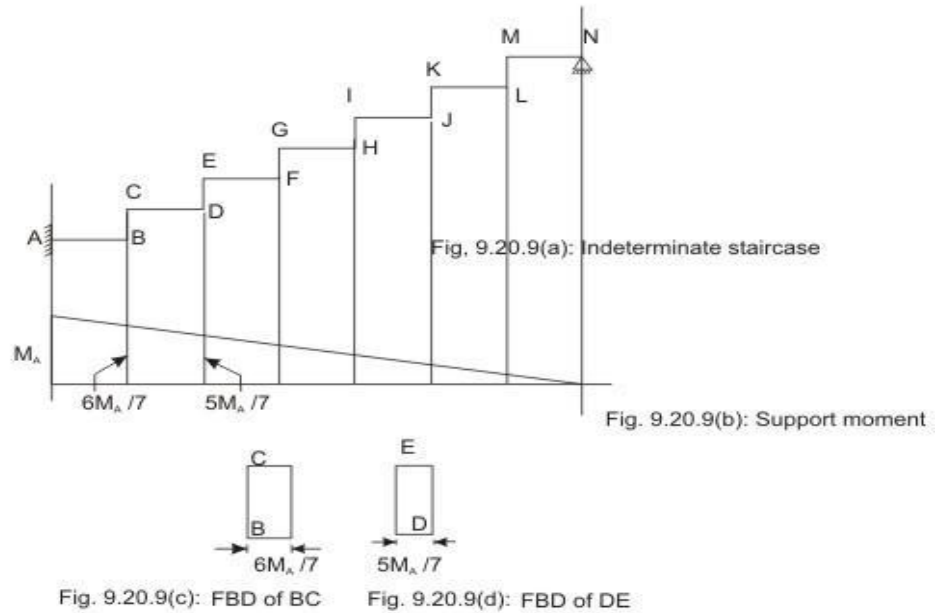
Structural analysis of an indeterminate trade-riser staircase
